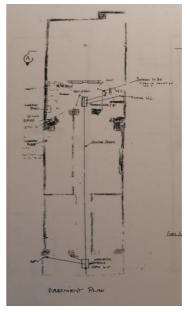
Extract from Drainage plan showing the historic partitioning to the front room and rear room.
